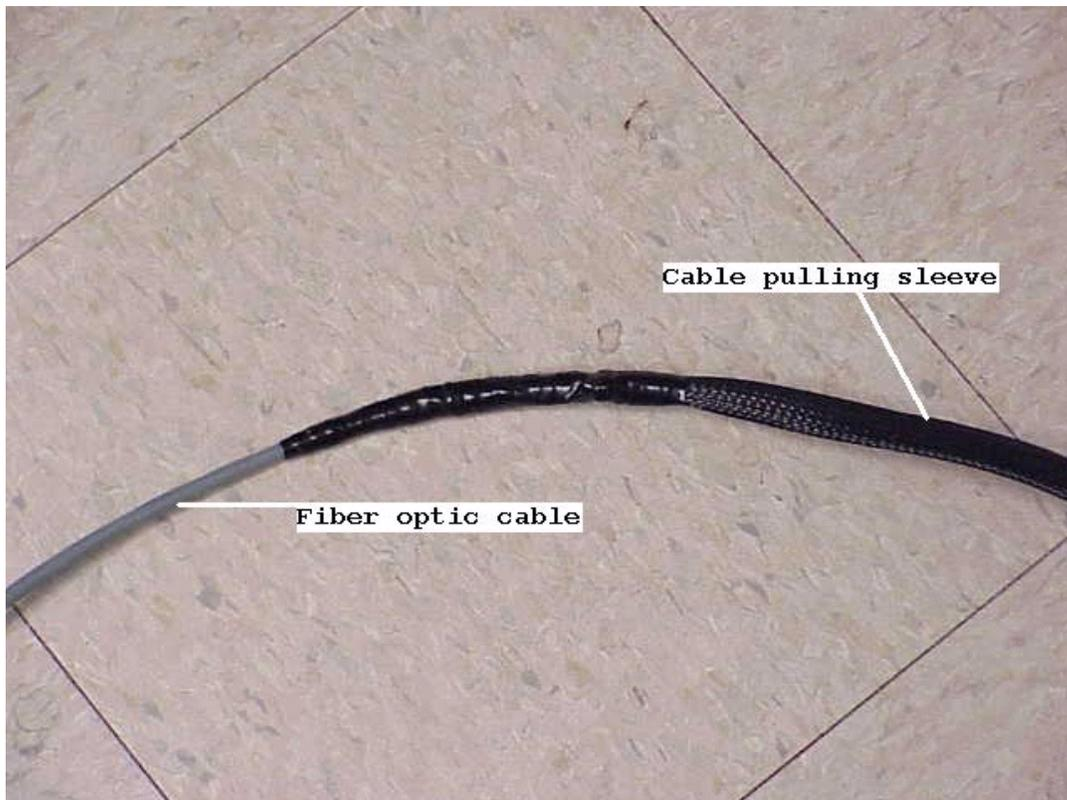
Cable pulling sleeve attached to fiber optic cable using electric tape.
